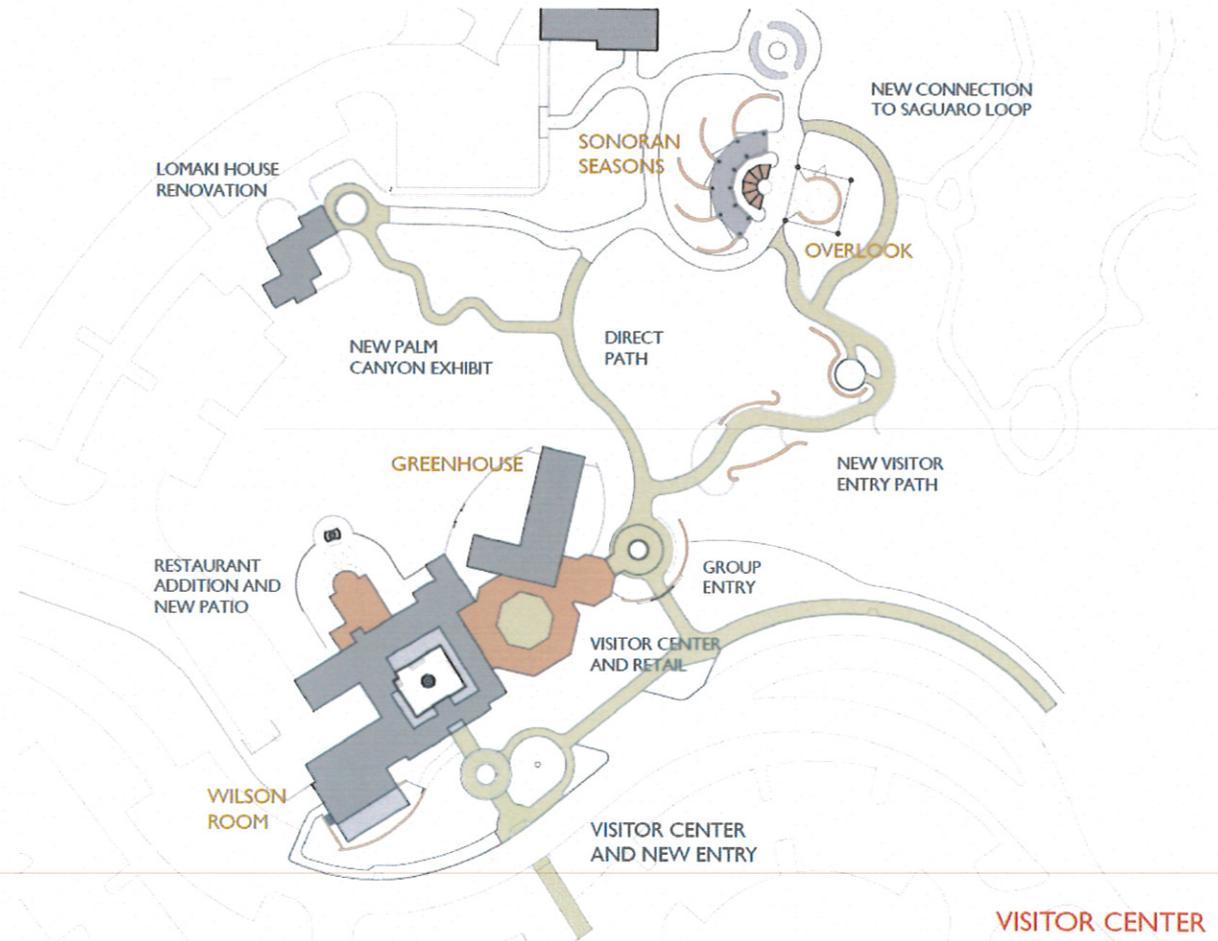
B: Visitor Center Conceptual Floor Plan
